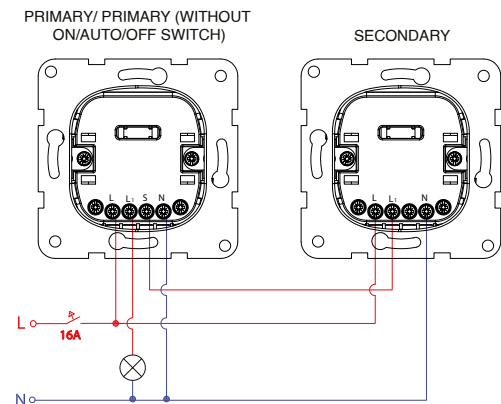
Connection for Primary/Primary(Without On/Auto/Off Switch)-Secondary (max. 1 Primary / 19 Secondary Parallel Connection)
